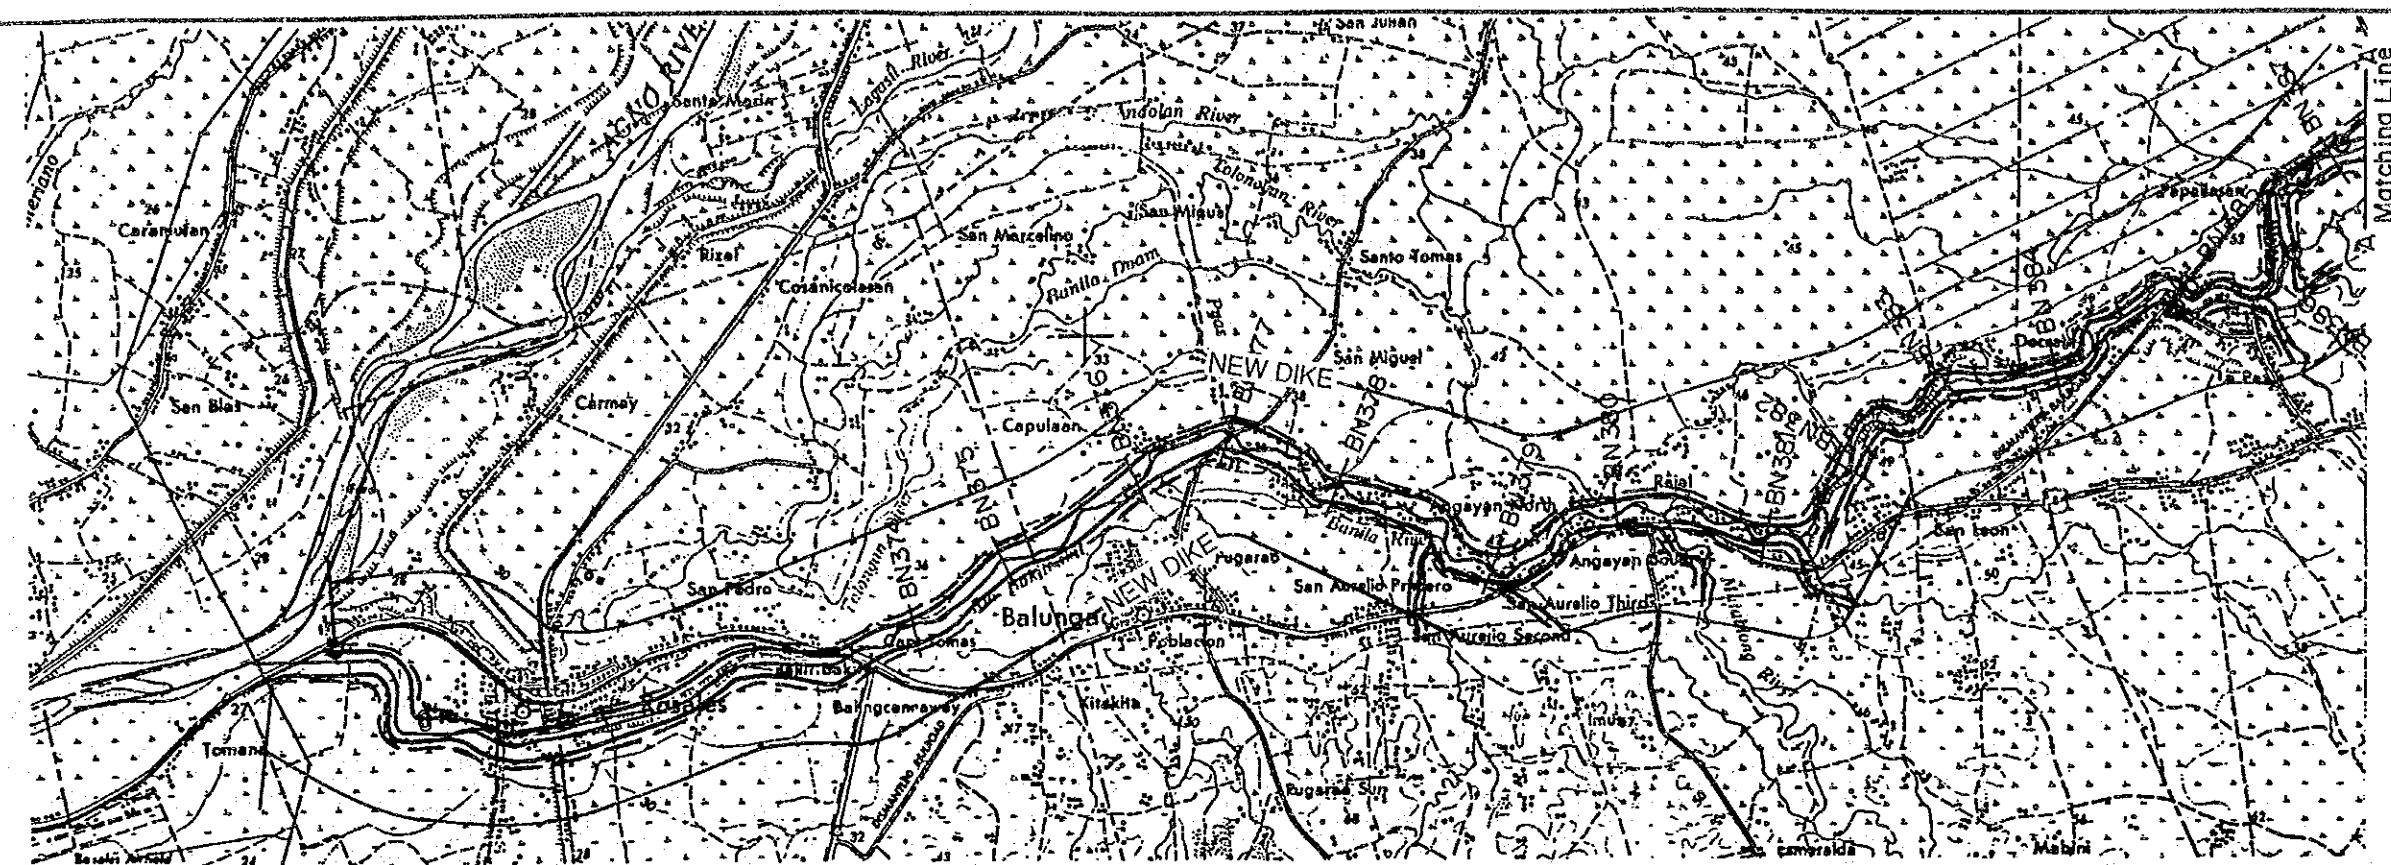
DESIGN PLAN OF BANILA RIVER
